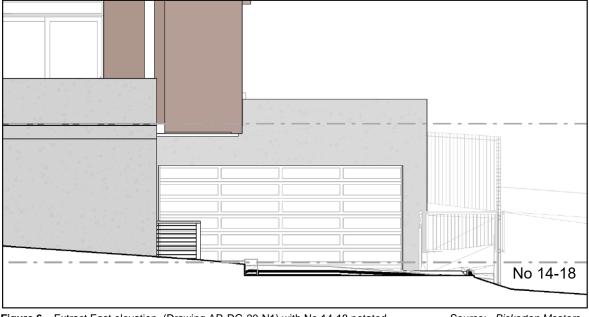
Extract East elevation (Drawing AR-DG-20-N1) with No 14-18 notated Source: Bickerton Masters
